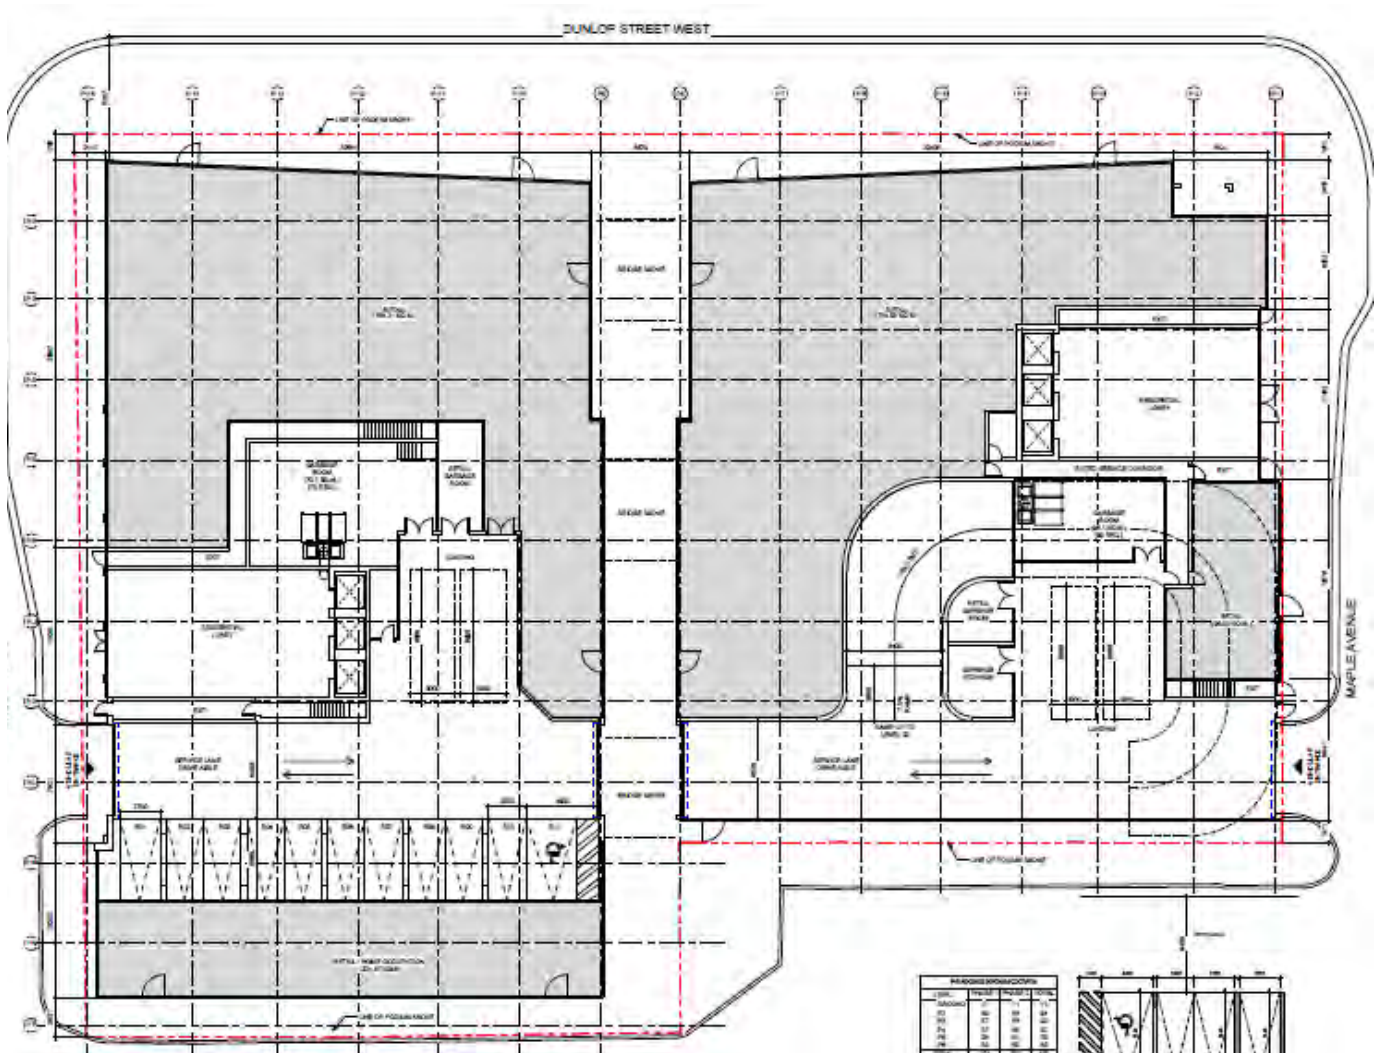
Ground Floor Plan showing loading, service areas and truck turn.
